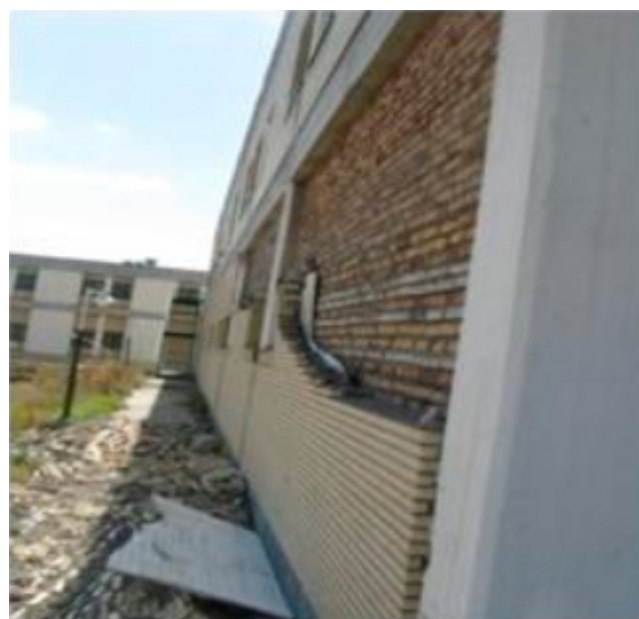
Some of the nonstructural damage to Herris Hospital.
